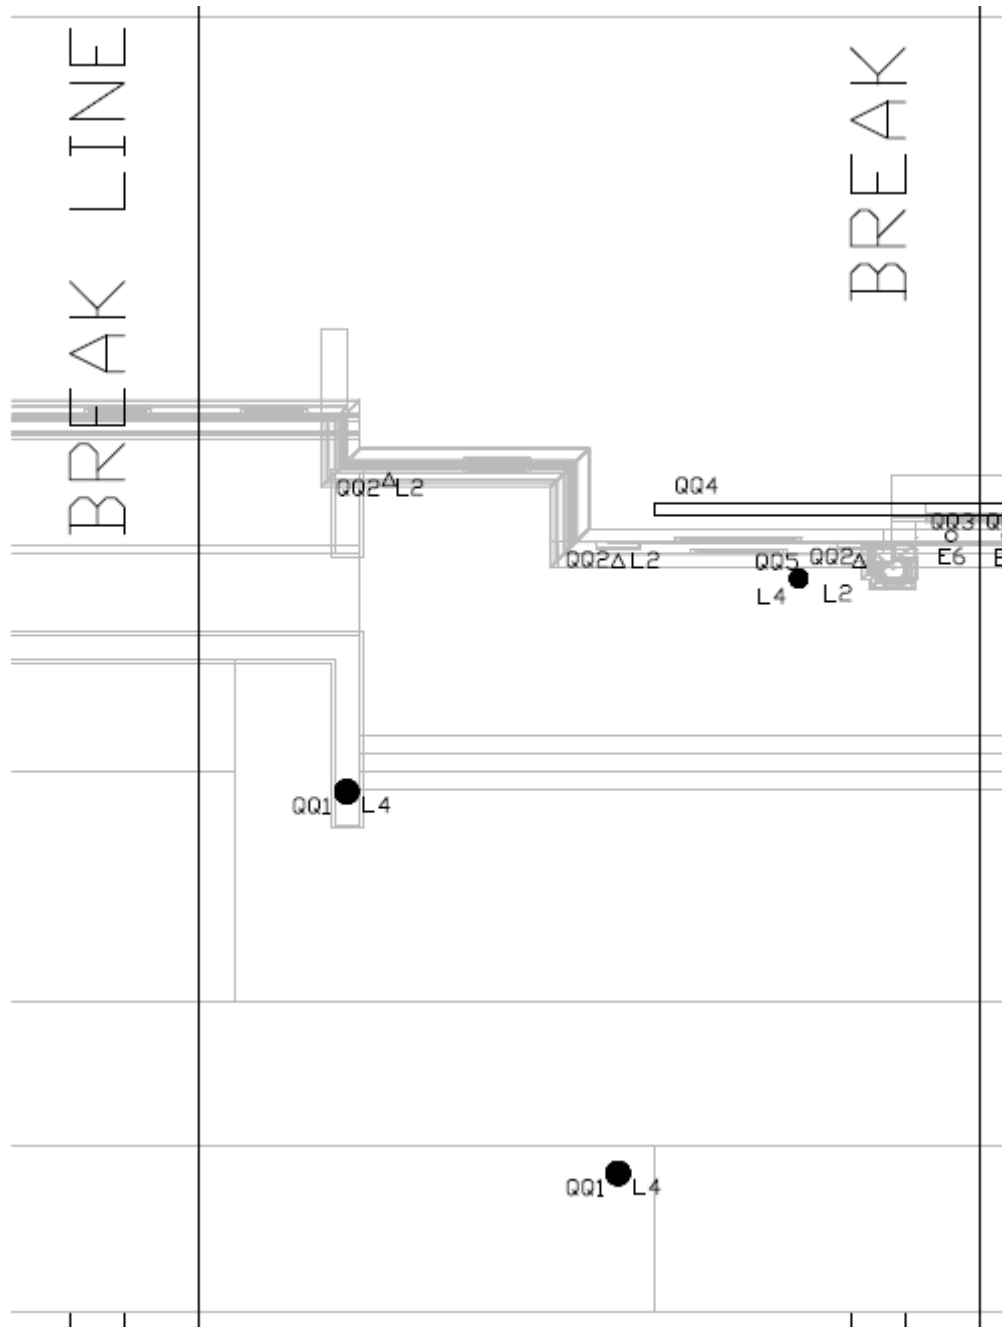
East Entry and Façade Lighting Plan – South Side of Entry
